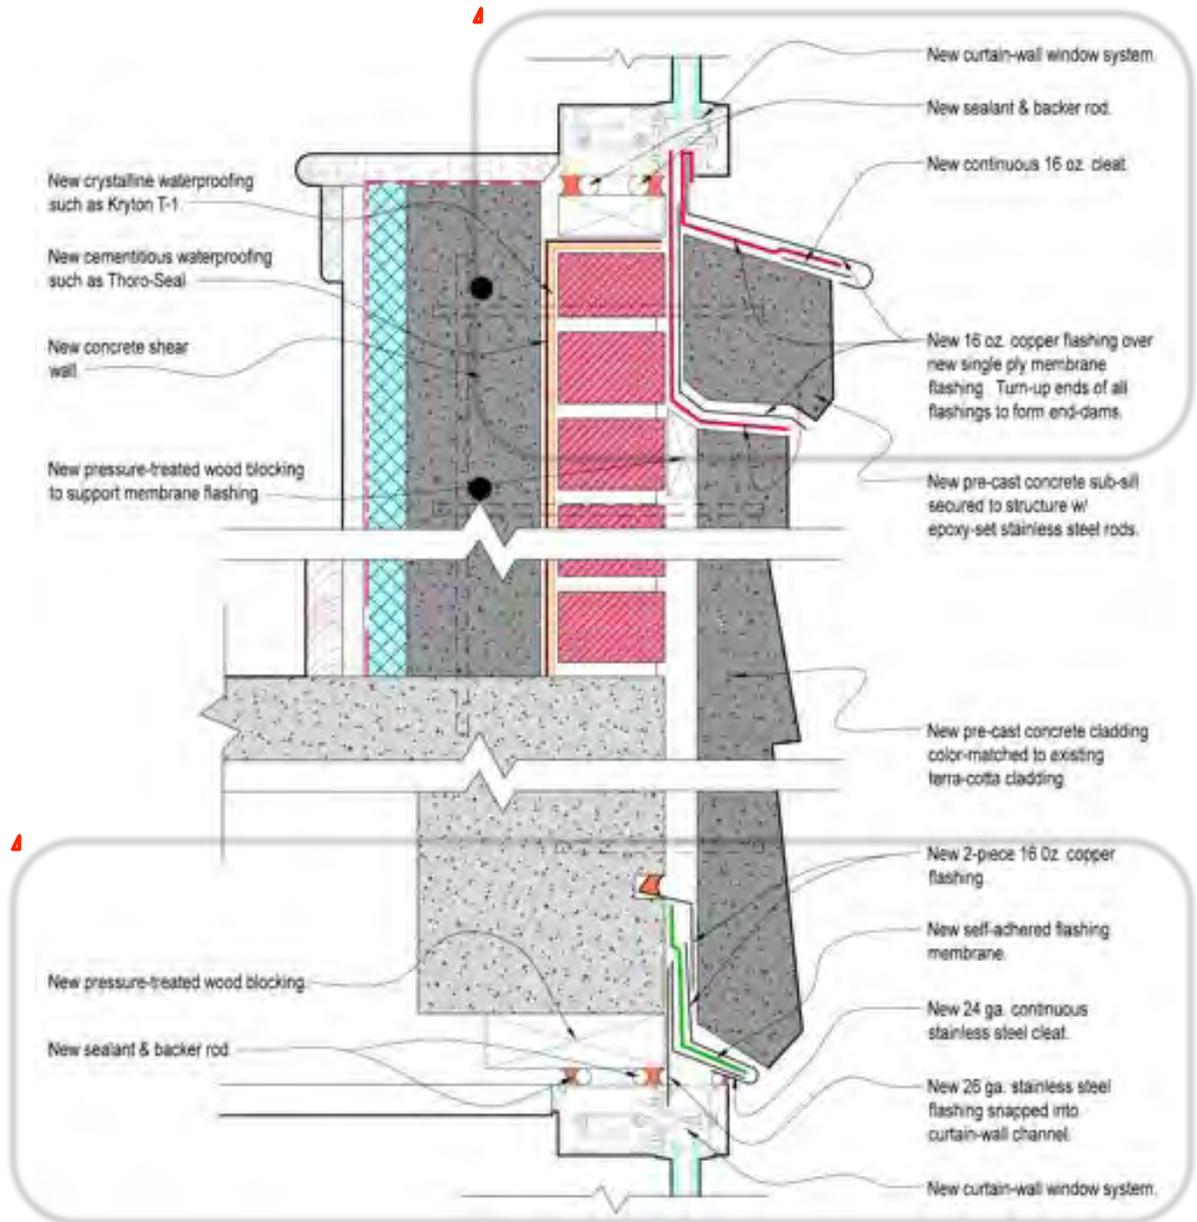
(1): Window Head & Sill Installation at Typical Cladding Panel Loc.
